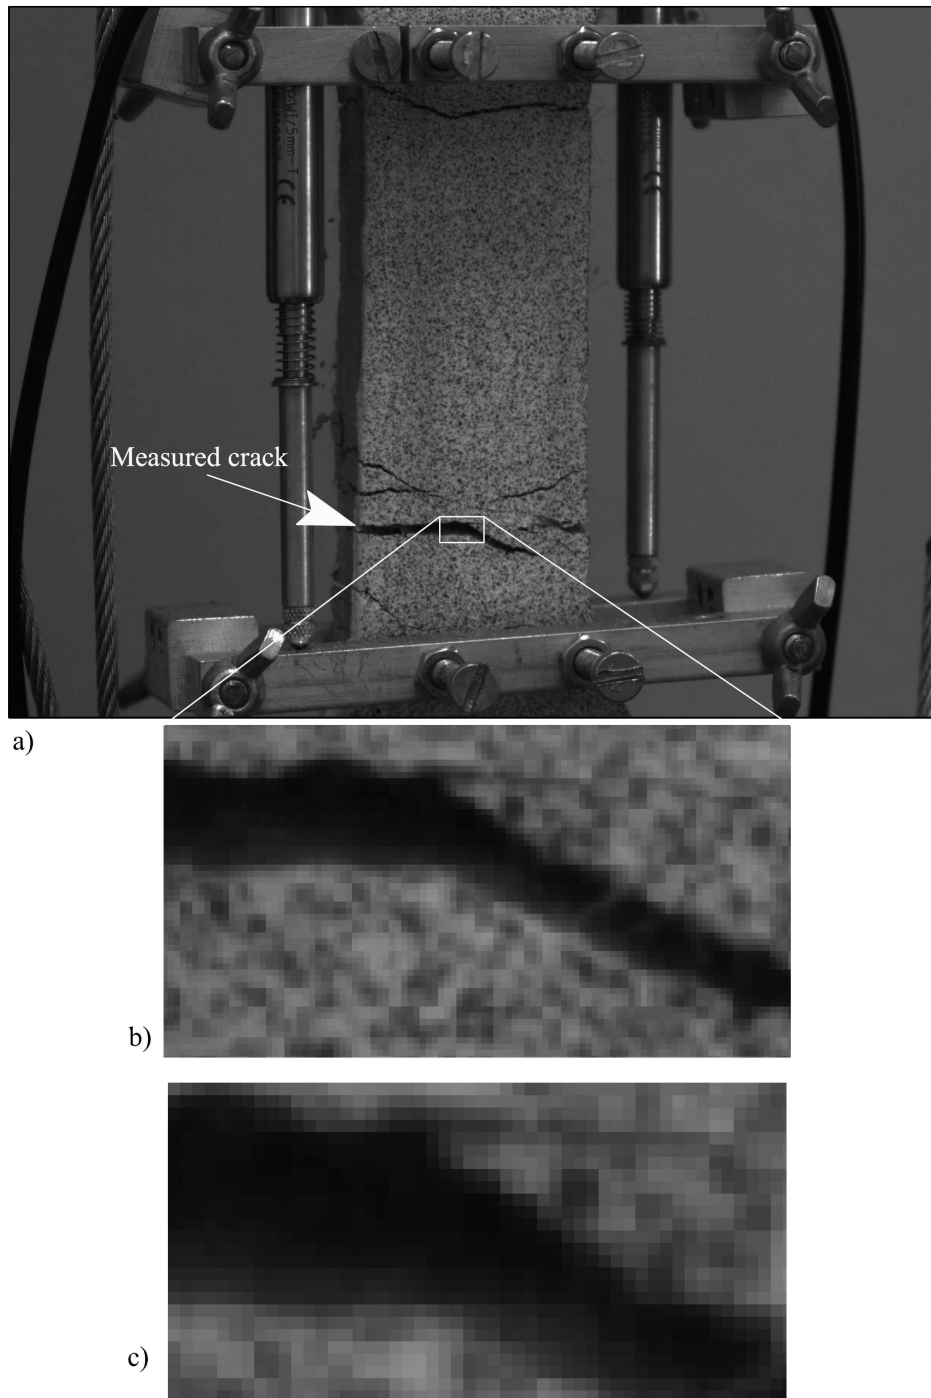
a) The test specimen shown with the developed cracks and the maximum crack that was measured in the CAD software, b) Enlarged view of the measured crack, c) Even more enlarged view of crack
